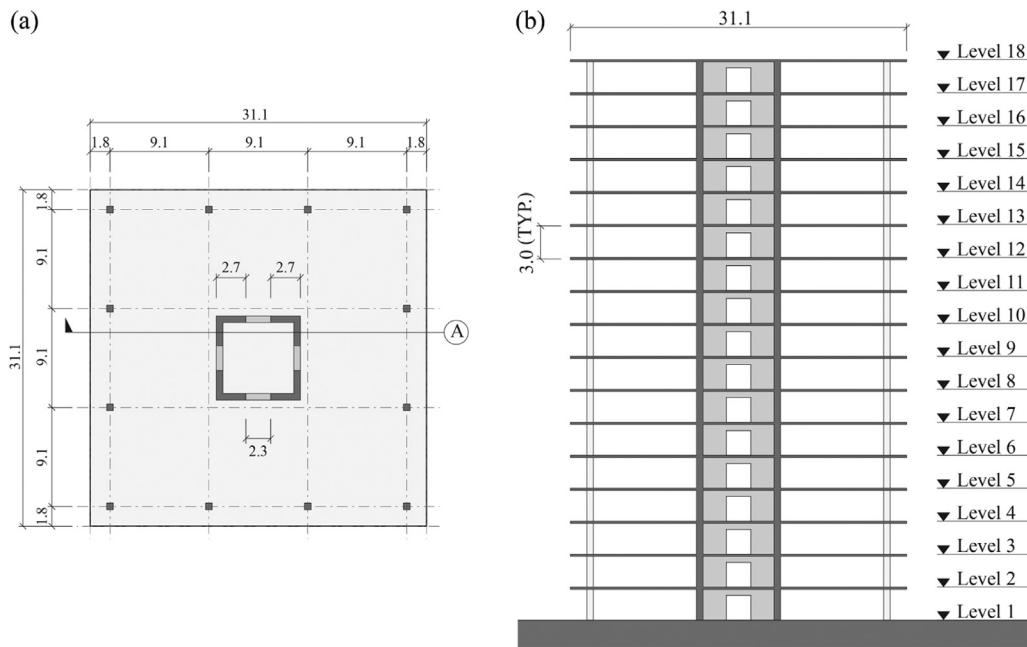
(a) Typical floor plan and (b) section A of the eighteen-story building (all dimensions are in meters).
